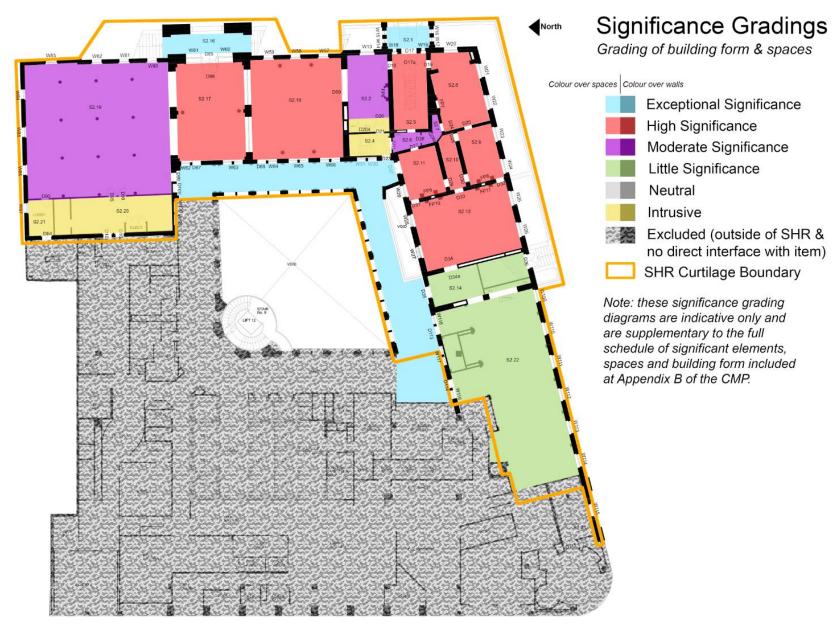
Grading Diagrams – Grading of Building Form and Spaces (Ground Floor)
